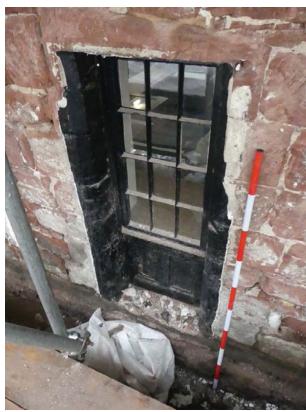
(left): Bow shop window in the south-west elevation, viewed from the south Plate 35 (right): North-west doorway in the south-west elevation, viewed from the south
